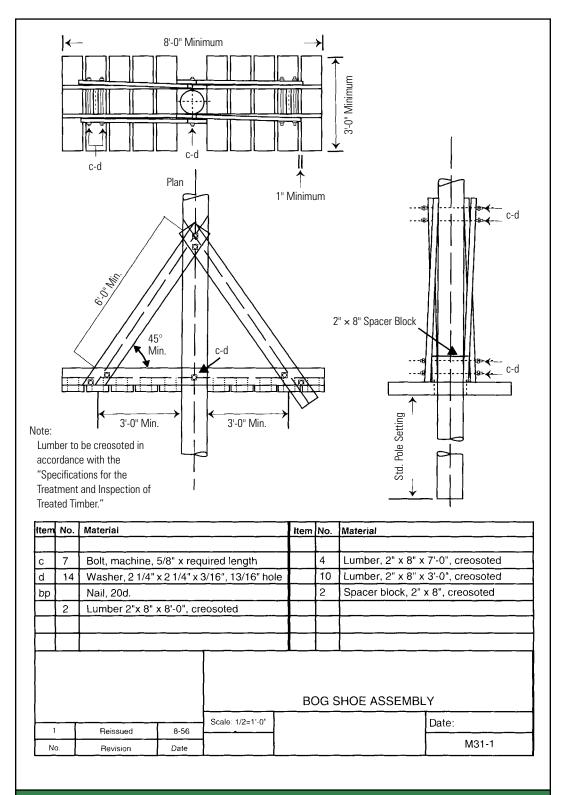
Special Drawing-Bog Shoe Assembly, M31, M31-1.
